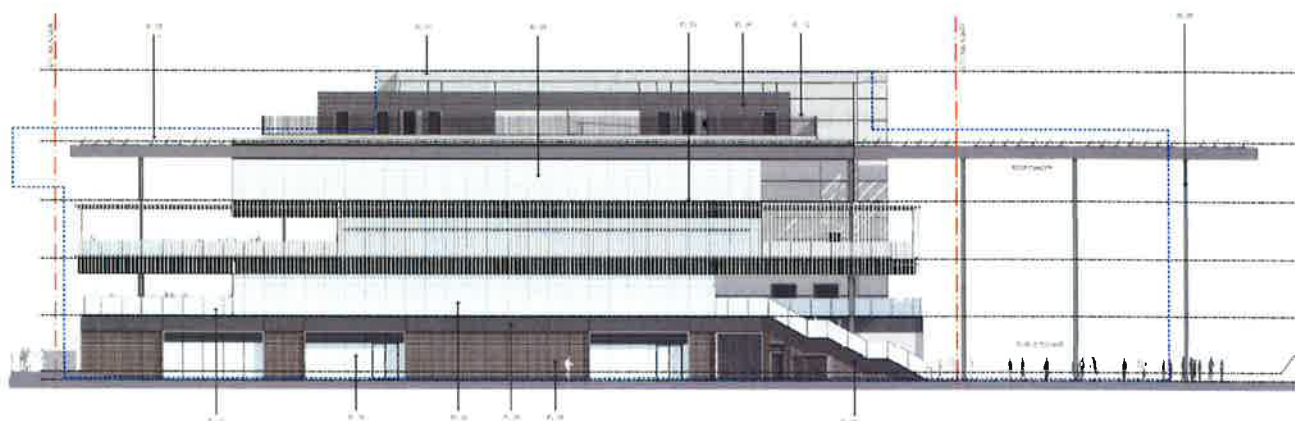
Western elevation to Davy Road, as proposed. Source: Applicant's EIS.
